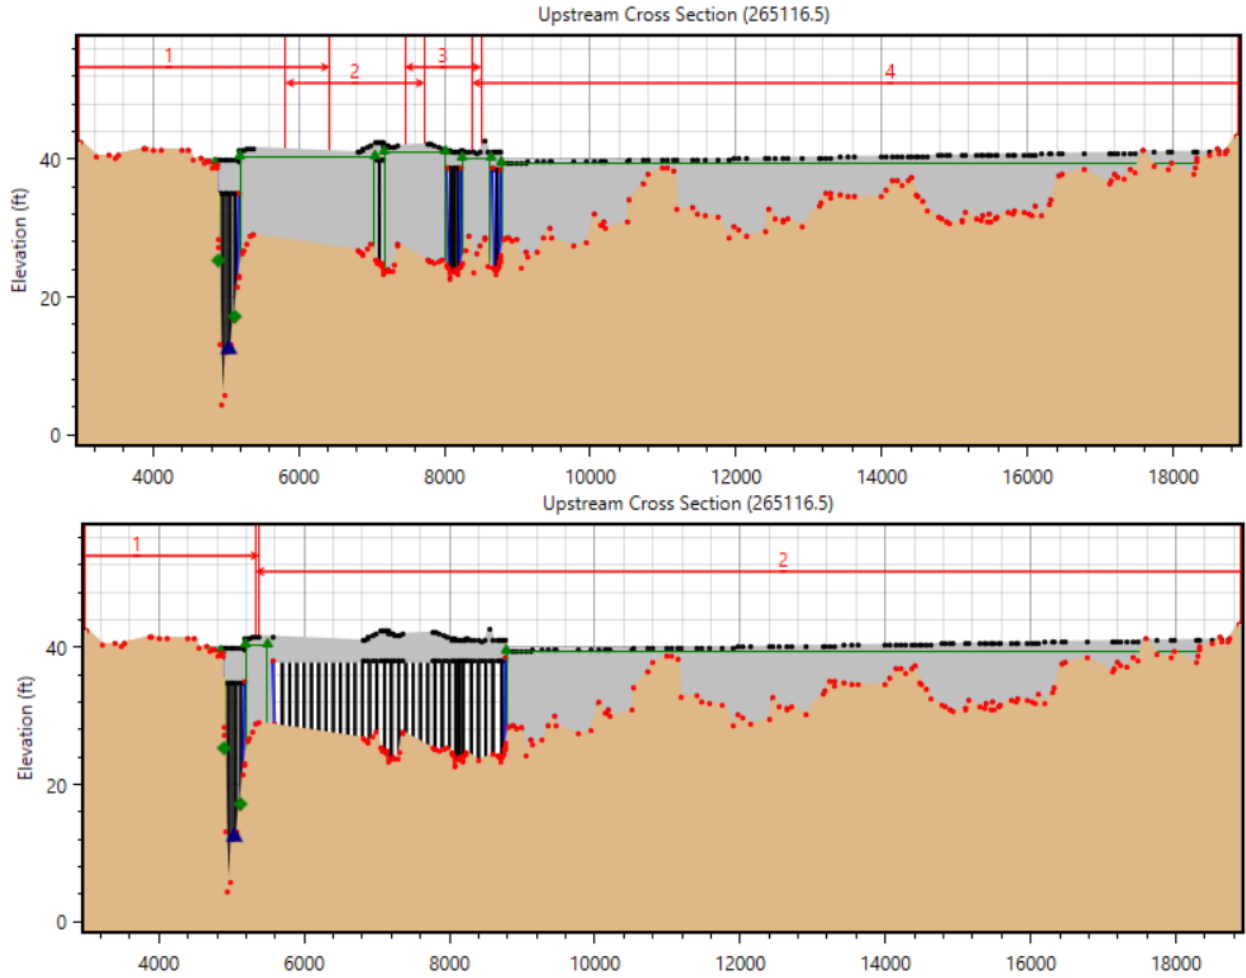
Existing (top) and modified (bottom) cross section for US 11 (King St.) Bridge in Kinston. The modified cross section shows the embankment partially removed, extension of the bridge deck, and additional piers.
